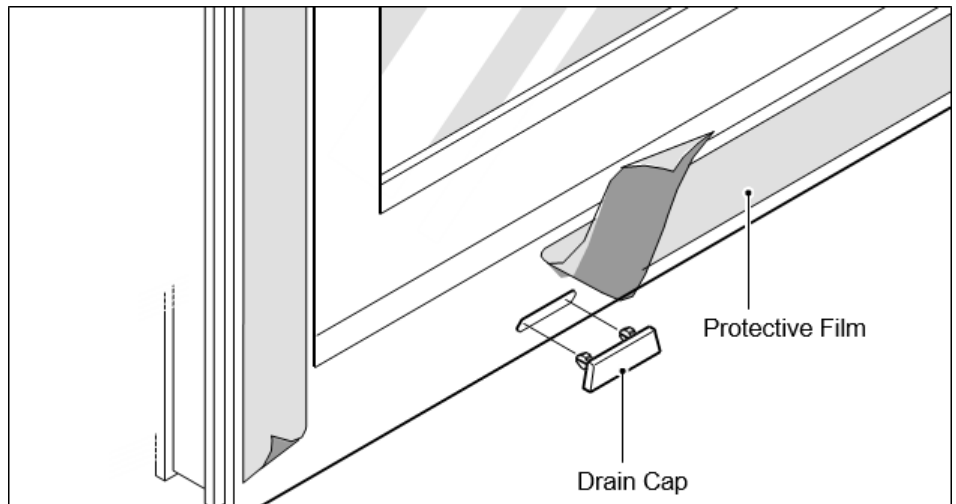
Remove the protective film and install the drain caps – exterior view
